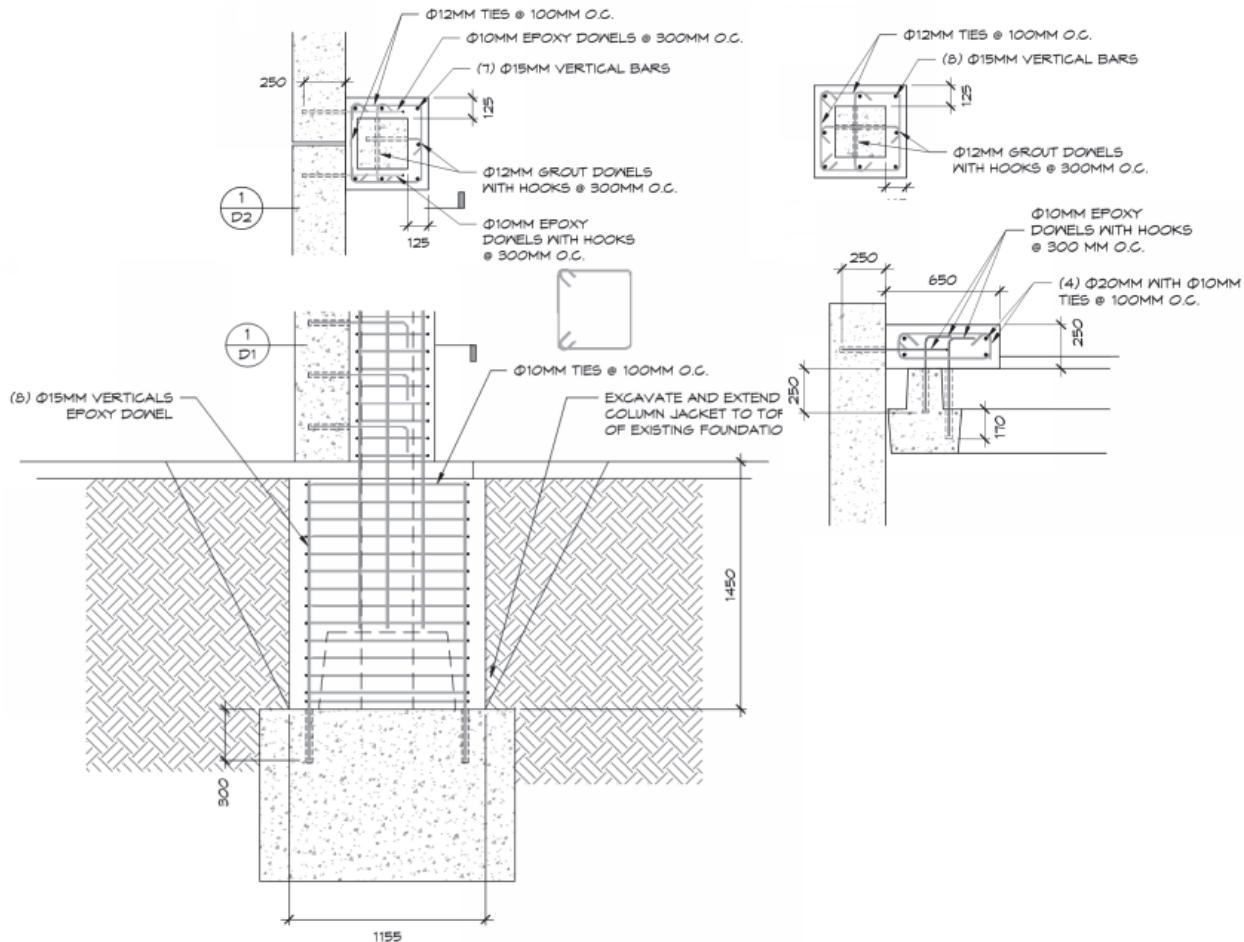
Column jackets extending to footing in PC Increment 2.
